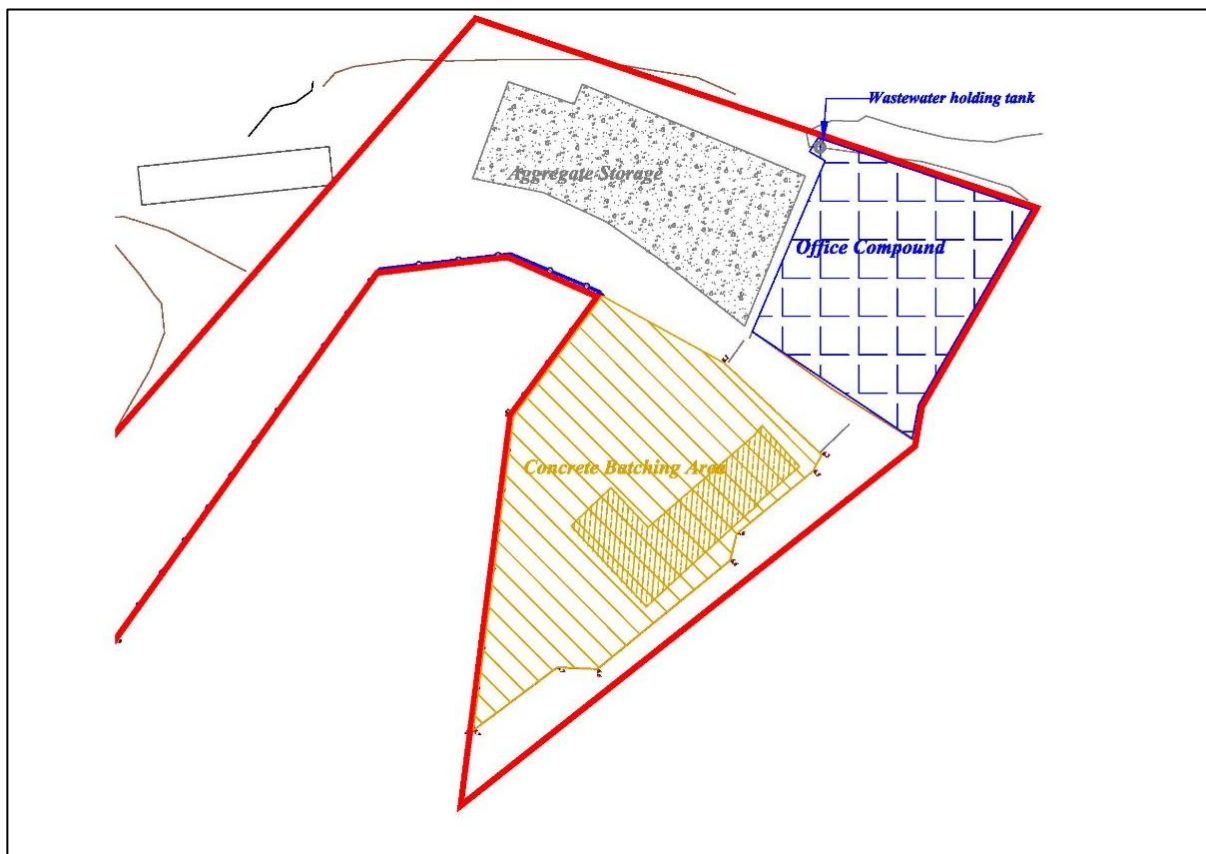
Layout for the Construction Compound Facilities at the northern end of the proposed development site.
